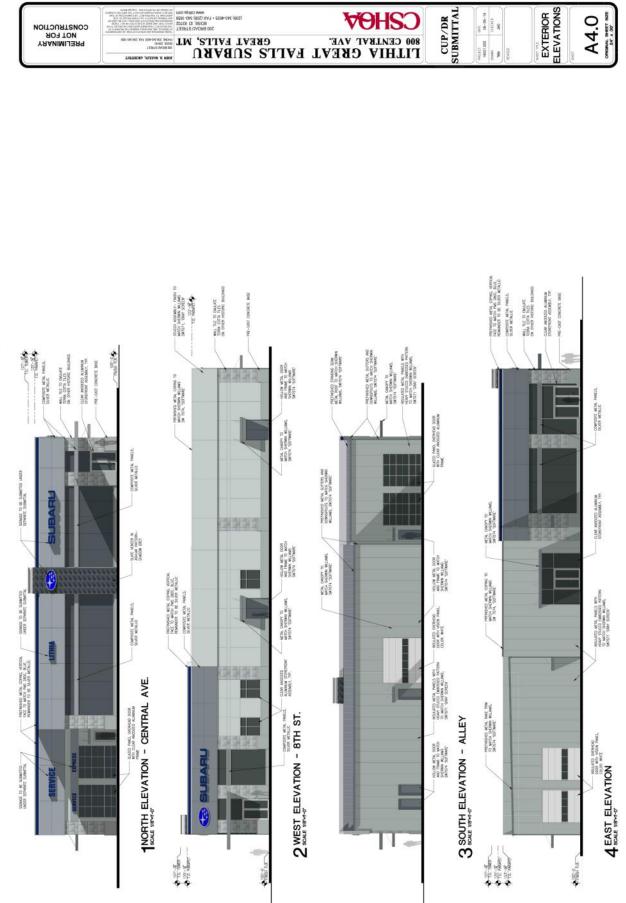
EXHIBIT J - ELEVATION RENDERINGS (CURRENT)
